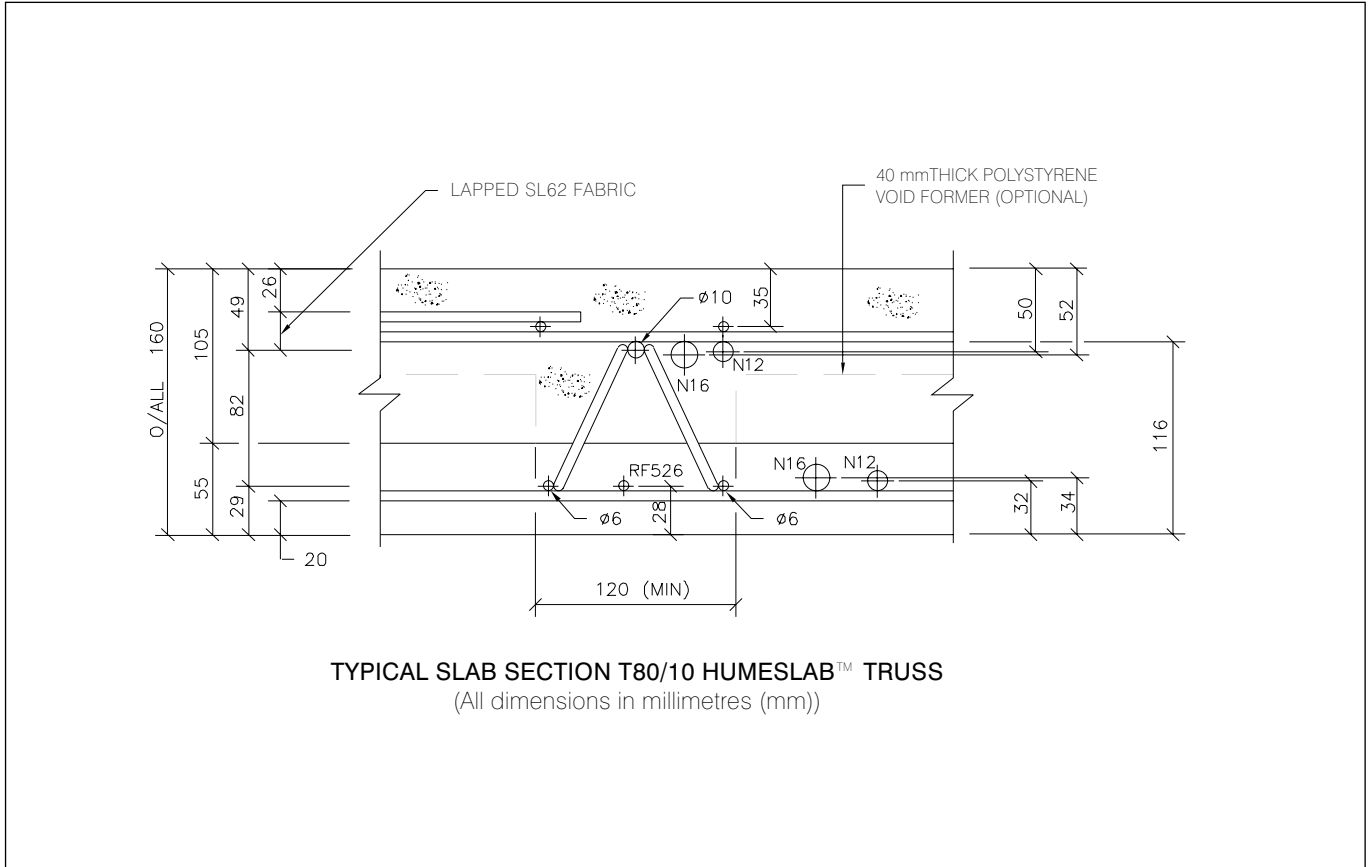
Typical, but not restricted to, reinforcement arrangements in slabs
